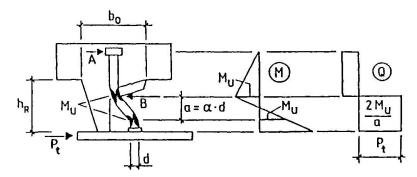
Failure Mechanism of stud used with profiled steel sheeting
